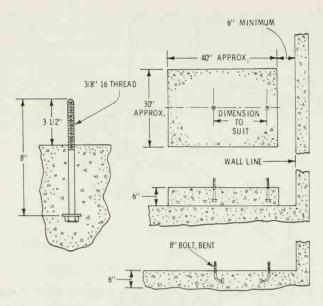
One recommended method of building a suitable cement foundation for the basement installation of a washing machine.
